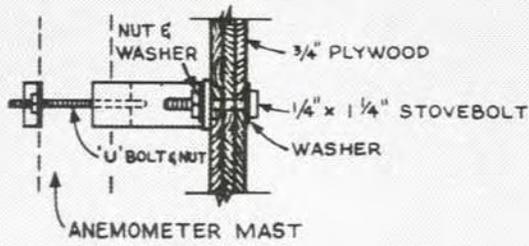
Instrument shelter anchor pin (section 16.1).
